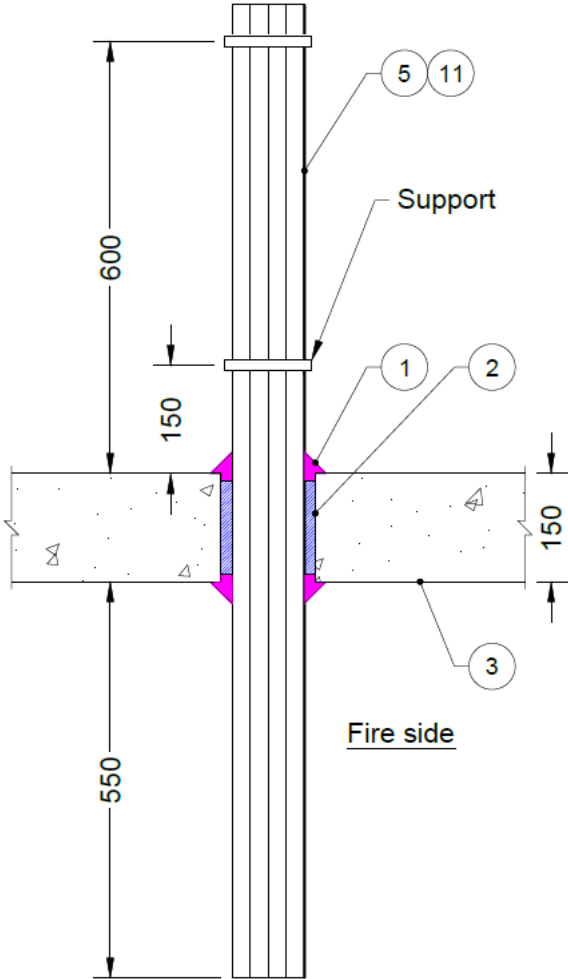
Elevation View of D1 and D2 Cable Services in floor
